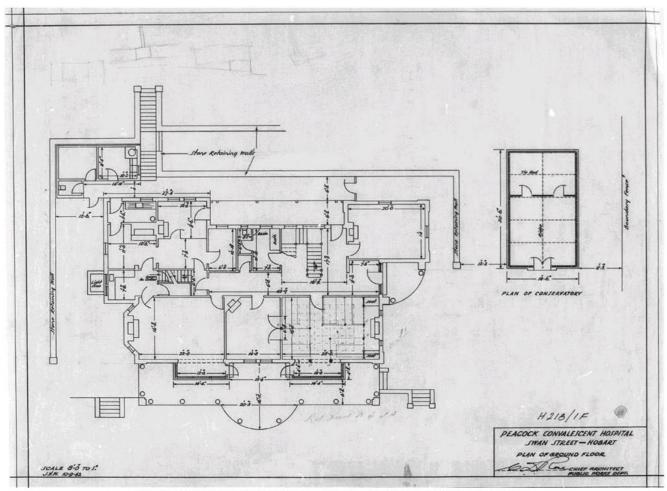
Ground floor plan of Ruardean, 1942. Tasmanian Archive and Heritage Office PWD266.4.43719.
